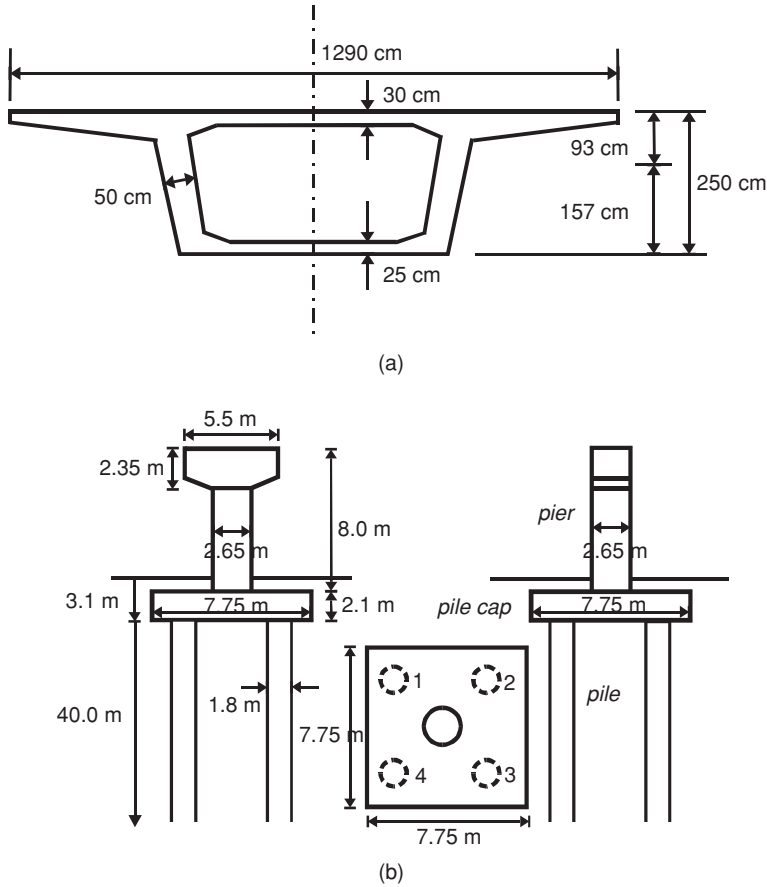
Geometry and dimensions of the bridge: (a) typical box-girder cross-section; (b) pier and pile foundation
